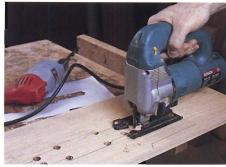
To form the opening on the backsplash, first drill relief holes at every inside corner, then use your saber saw to cut from hole to hole.
